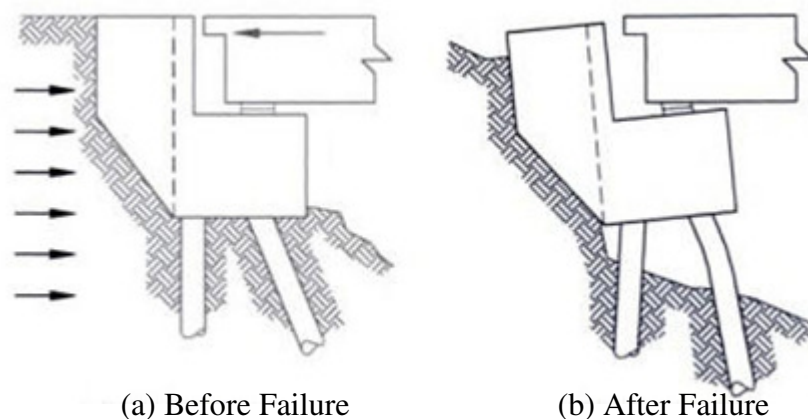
Abutment slumping and rotation (Adapted from Priestley et al. 1996).
